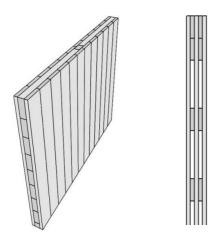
Solid timber wall elements (Swedish wood, n.d).
